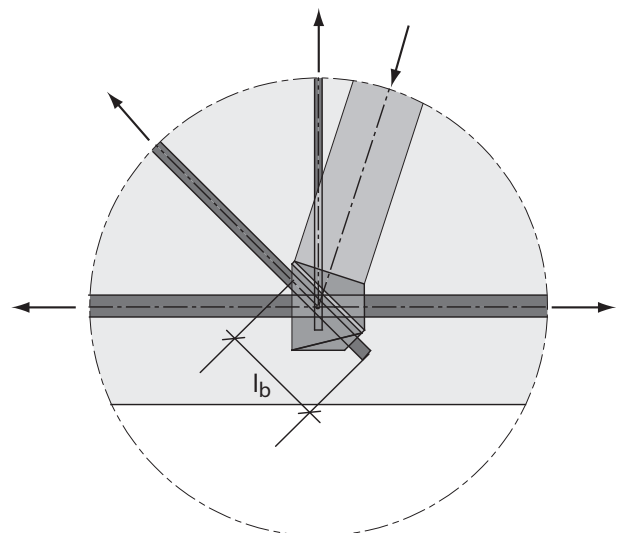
Provided anchorage length of diagonal reinforcement assuming a hydrostatic nodal zone.
